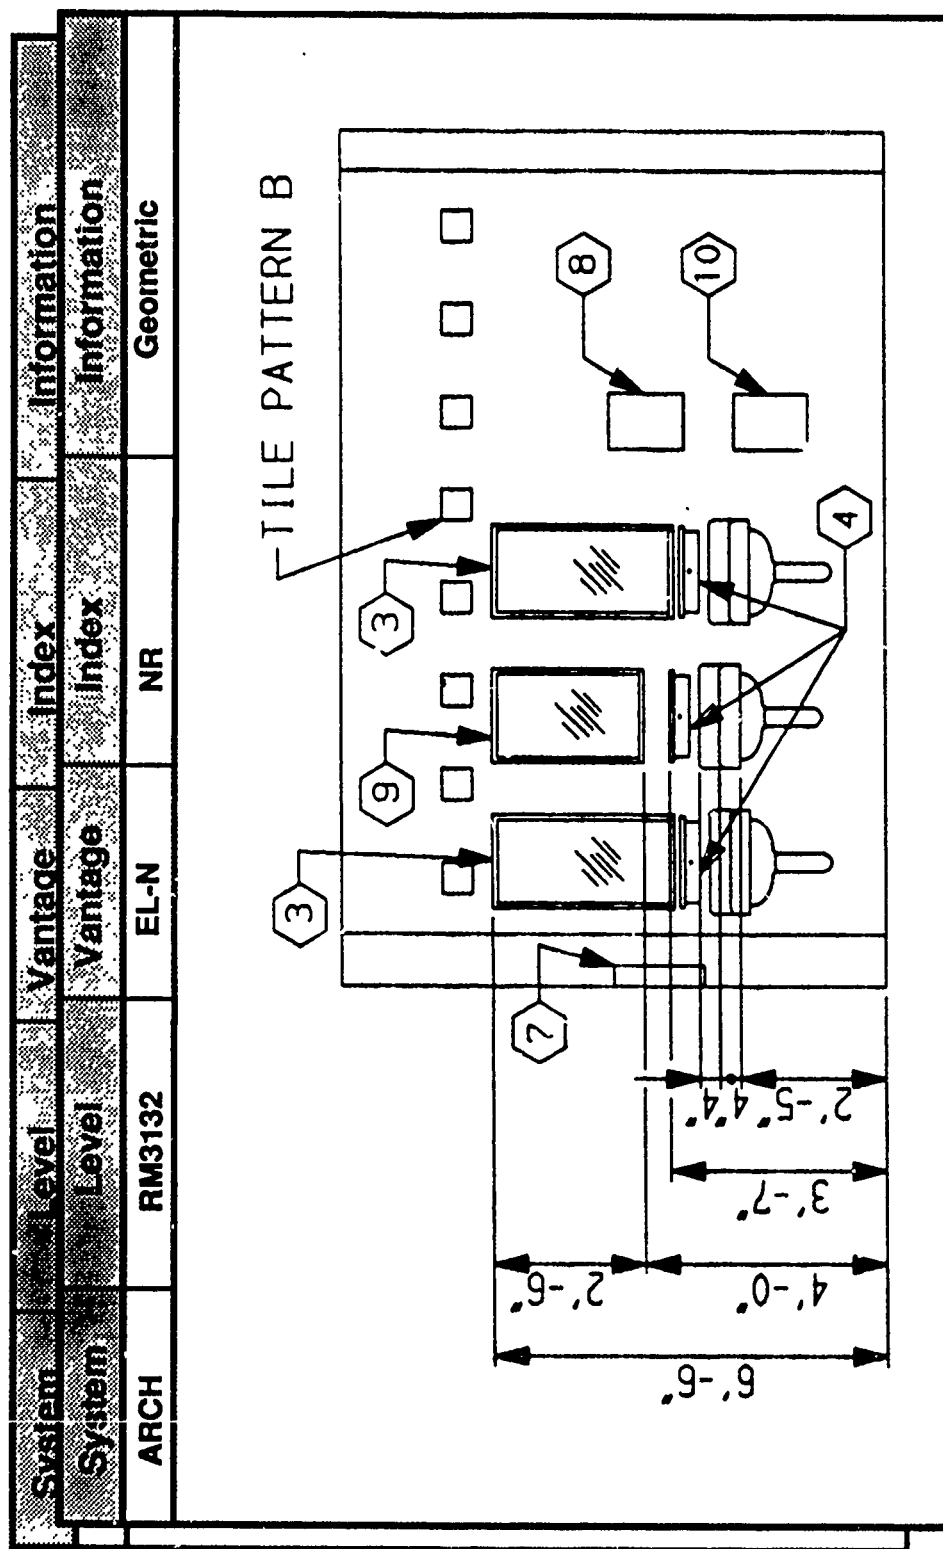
Example of Frame for Case 13: Room 3132, North Elevation
